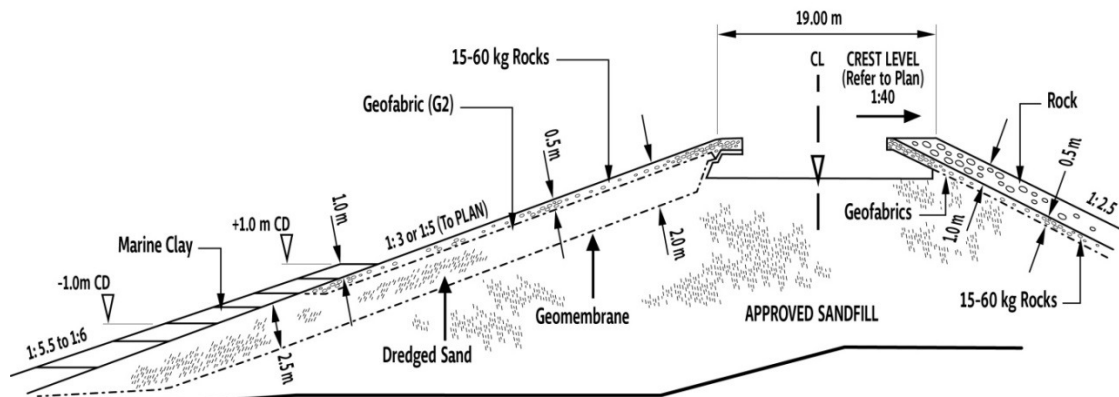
Palau Semakau Bund Site Plan and Cross-section with Geomembrane
